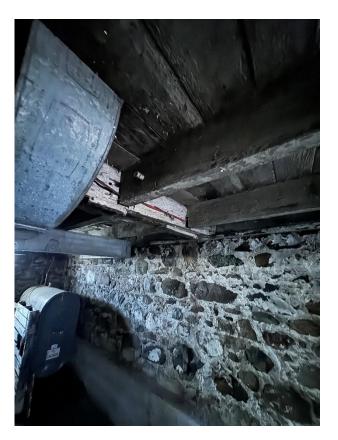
Basement, joists cracking and notching. Plank decking spanning over joists.
